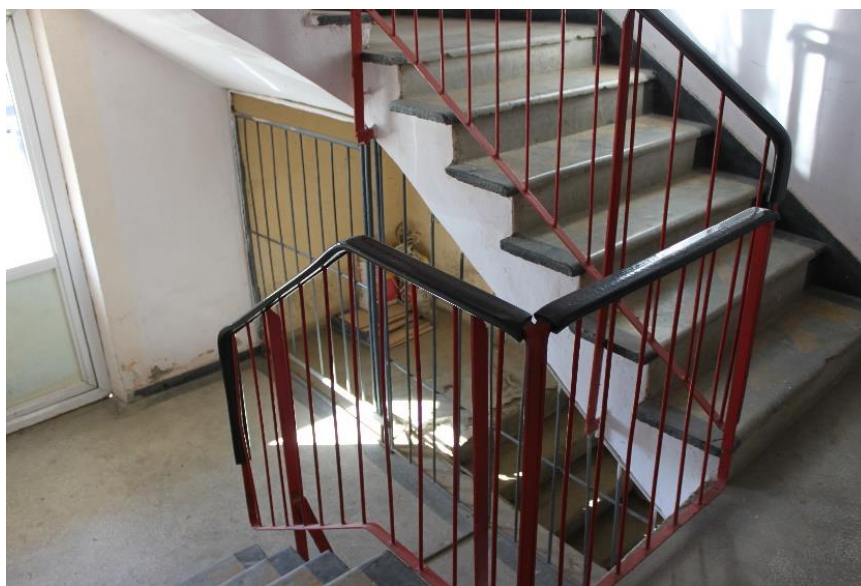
Example of the original floor made from poured concrete in ‘A’ Block.
